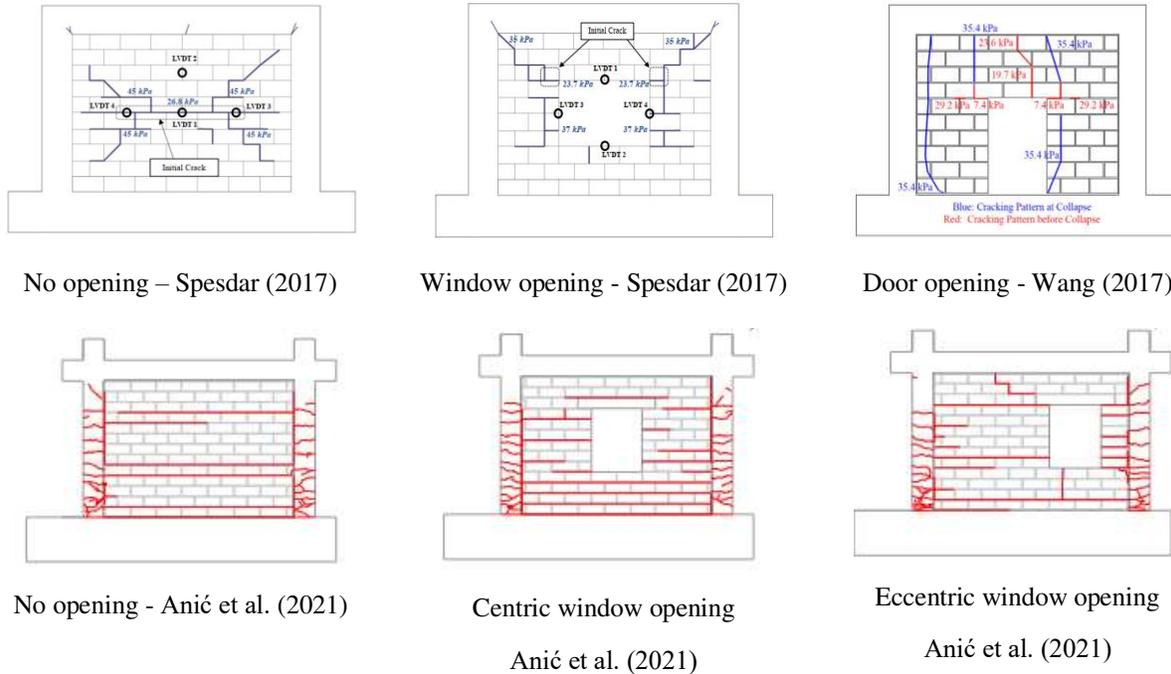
Influence of openings in the cracking pattern of infill walls developing due to OOP load
